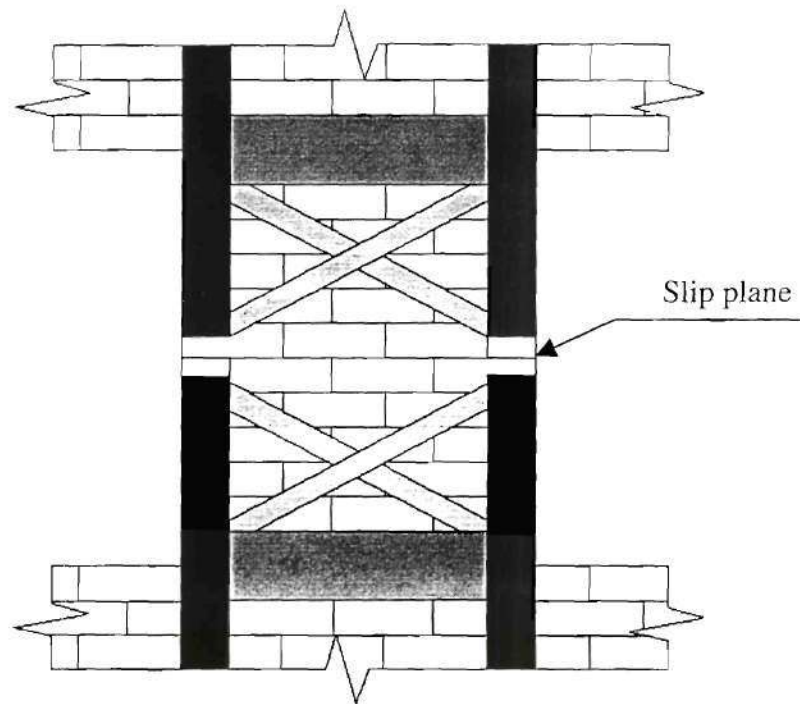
Special configuration of FRP retrofit to enforce bed-joint sliding at the mid height of the pier
